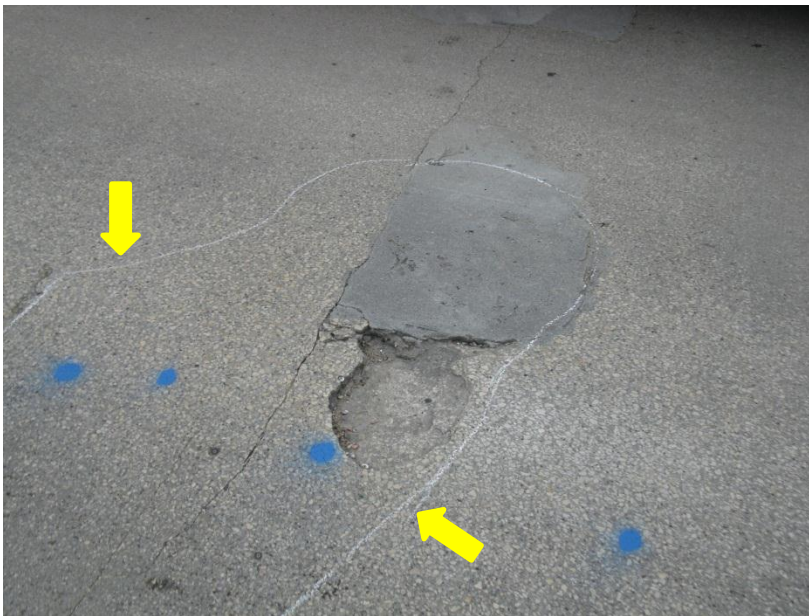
Existing concrete patch repair and cracking of deck. Note adjacent spall and new delamination (arrows) outlined in chalk.
